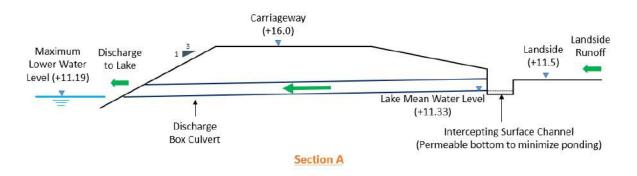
Typical Cross-Section of Drainage System at Shoreline Embankment
